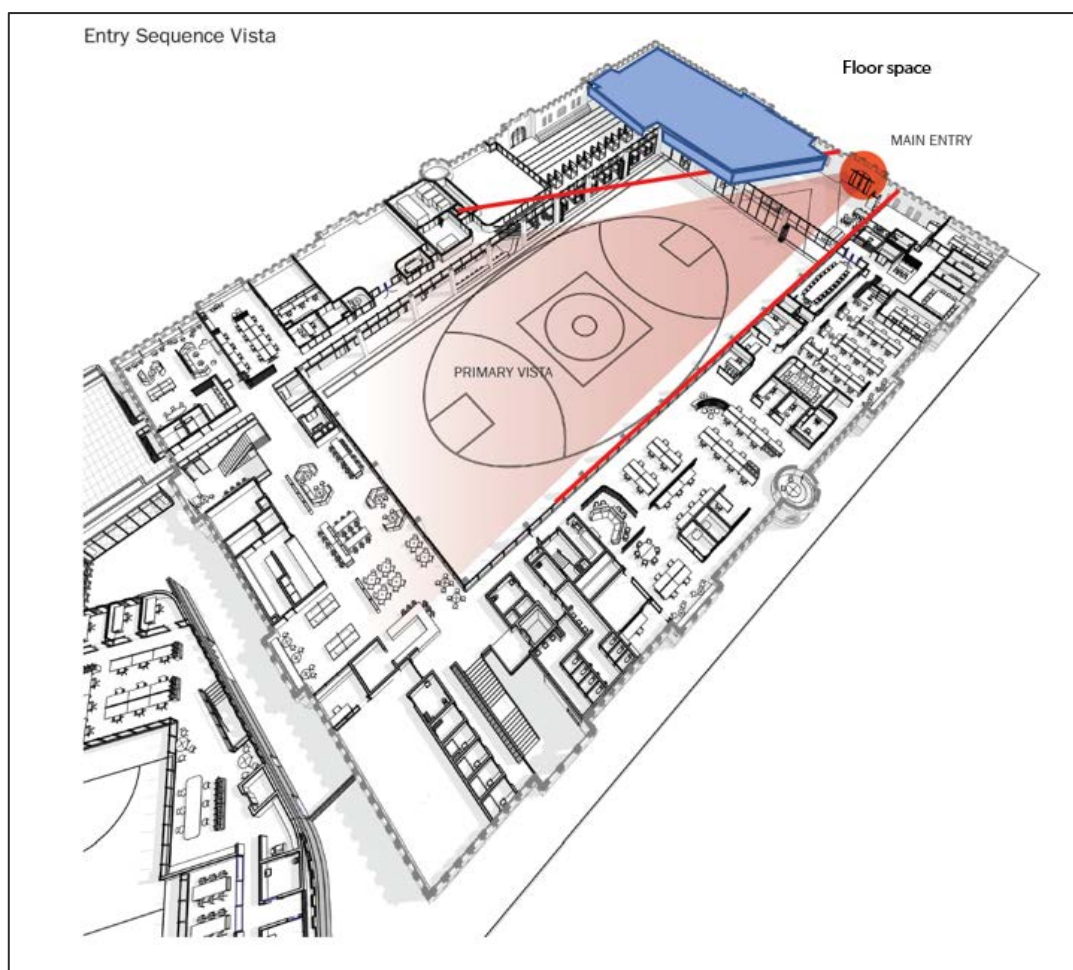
| Image showing view through the central space and floorspace to north west (Base source: Applicant's RRFI).
